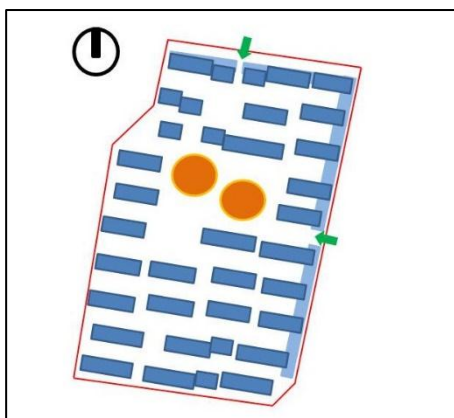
Plan of typical six storey block or slab housing with 23% SC. (Source: authors)
